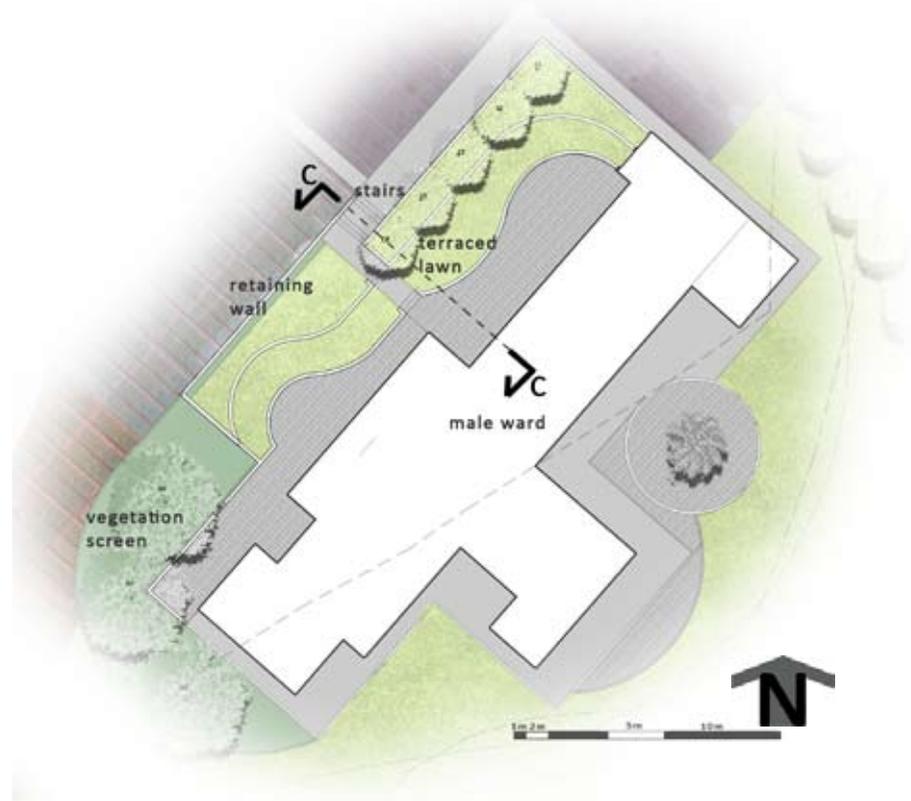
Plan of the outdoor room at the male ward (Author, 2009).
